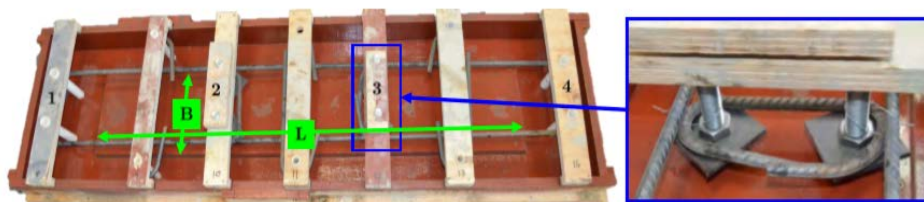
Concrete beam dimensions (De Beer, 2016).
